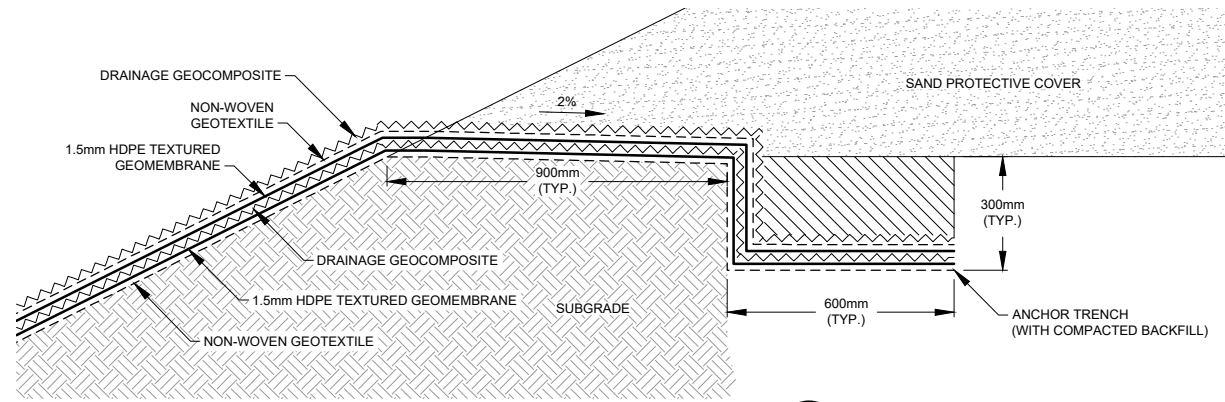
LINER SYSTEM (TOE OF SLOPE) SOUTH (TYP.)
